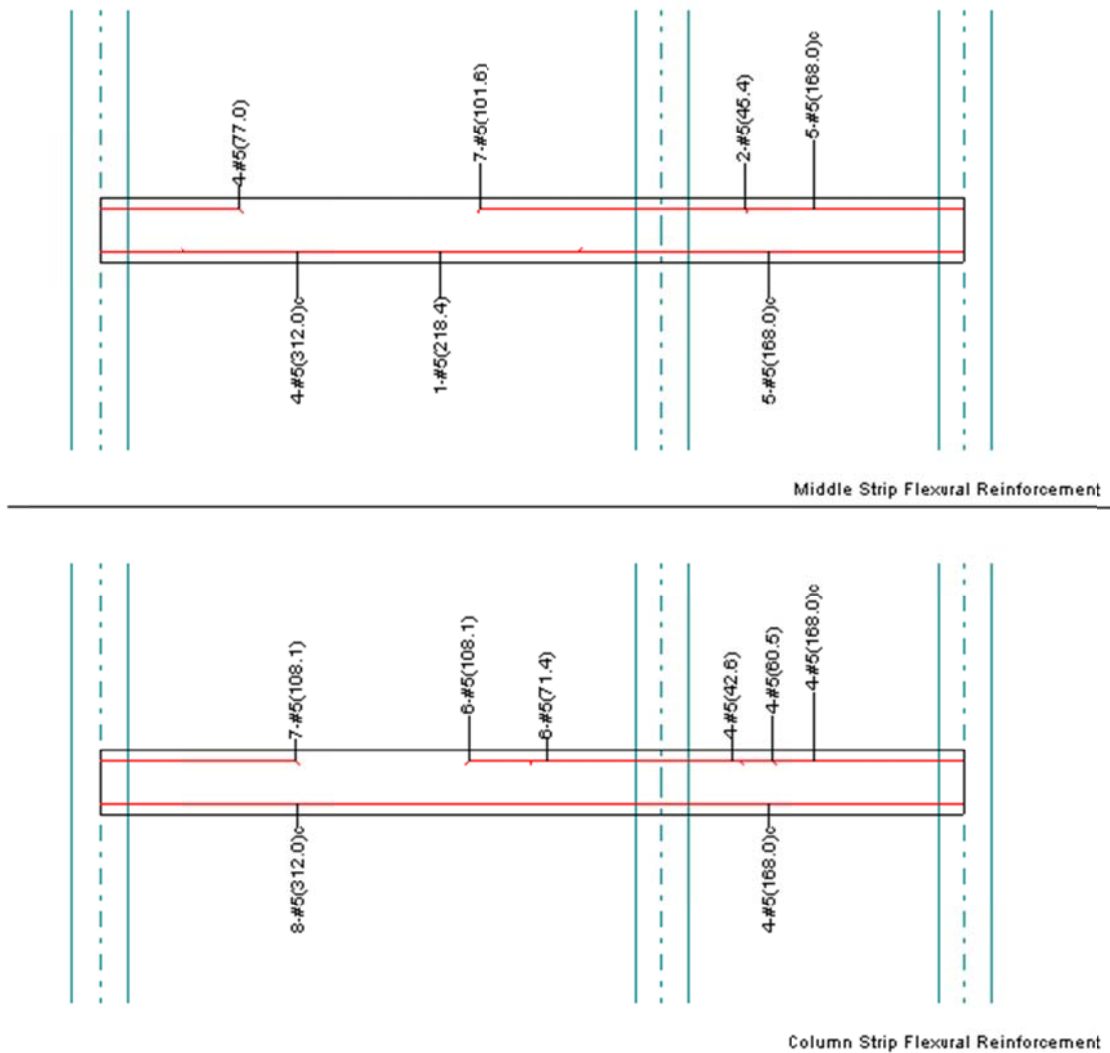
spSlab Column Line B.1 Reinforcing Diagram
